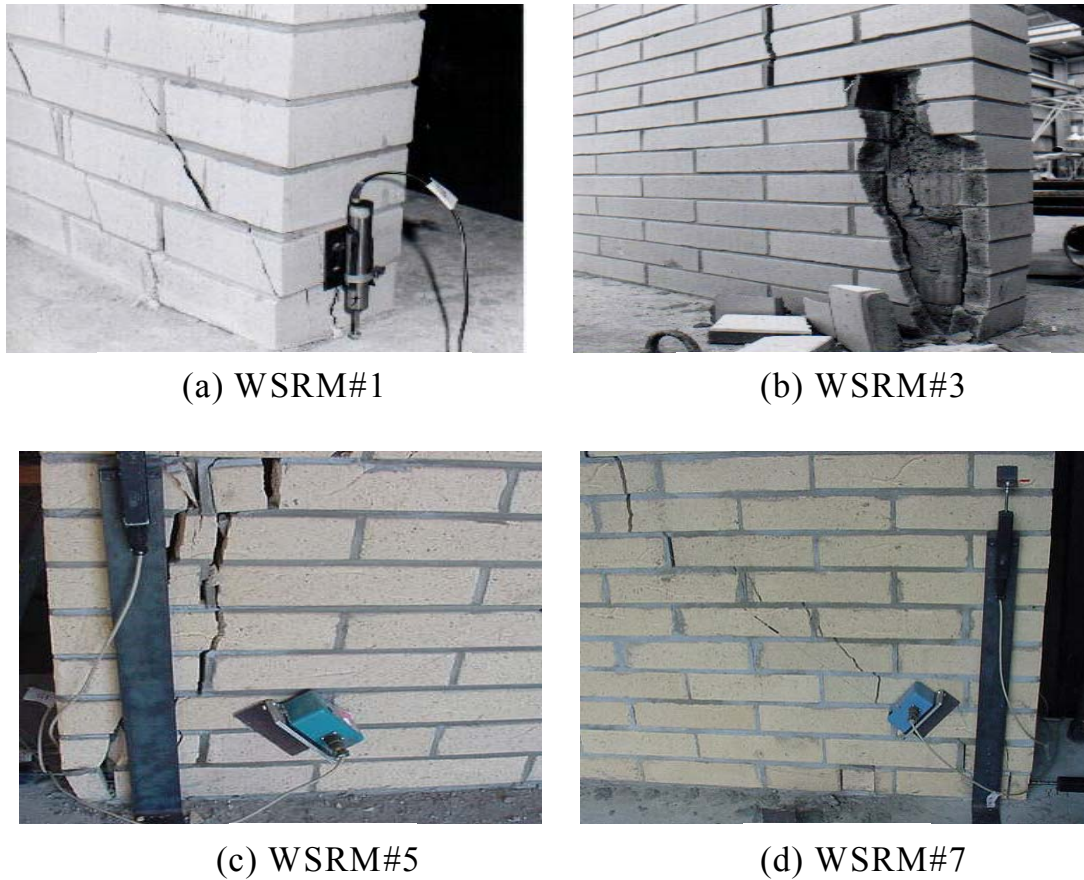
Toe crushing of WSRM walls under monotonic loading
